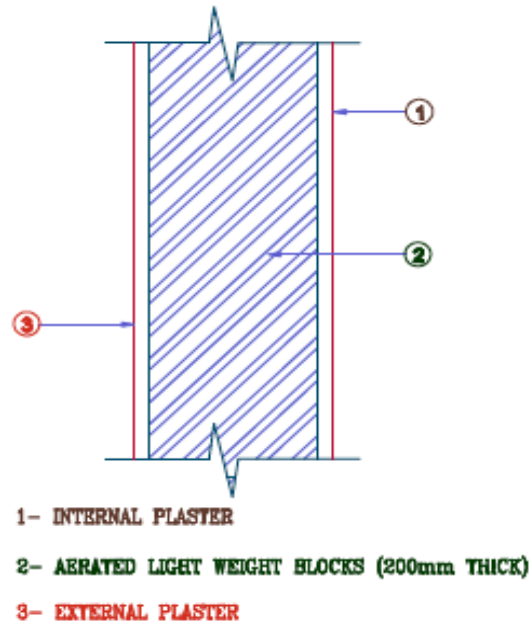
Bahrain current wall construction detail in housing units (Source: Bahrain Electricity and Water Authorities, 2014)
